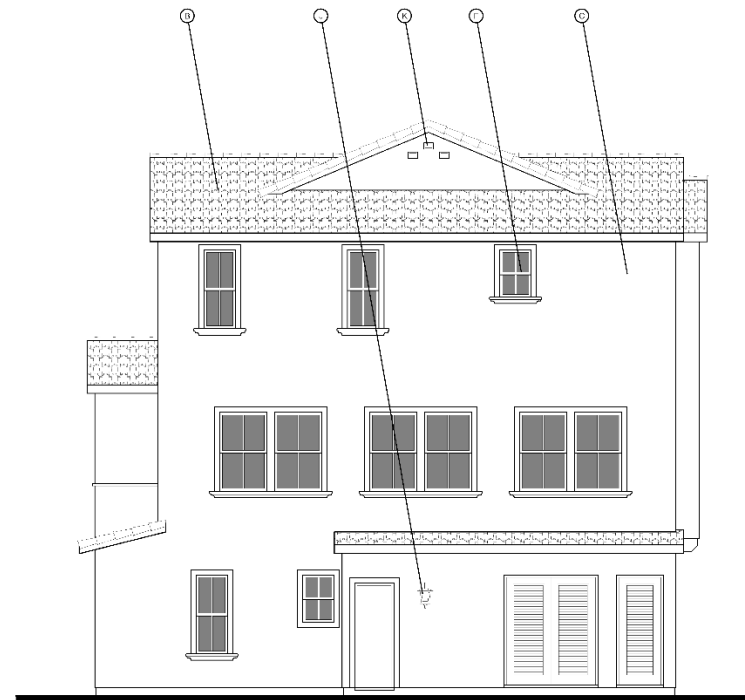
Spanish Colonial Elevation - Townhome (6-Plex) – Side
